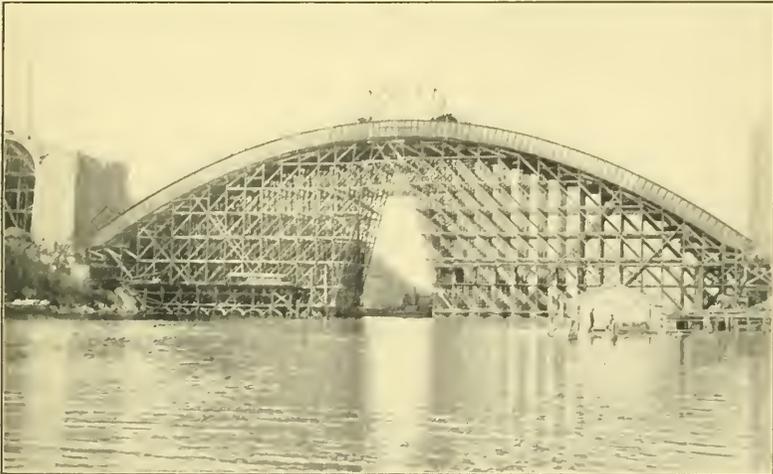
ERECTION OF THE WASHINGTON BRIDGE.
